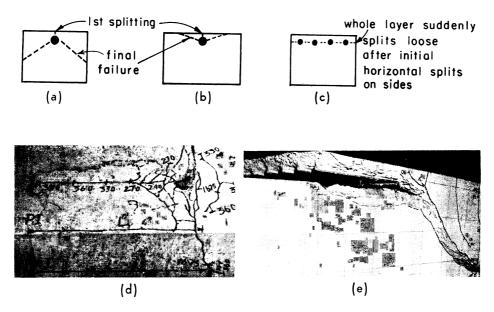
Splitting cracks and ultimate failure. (a) Typical. (b) and (d) Very wide beam. (c) and (e) With closely spaced bars
